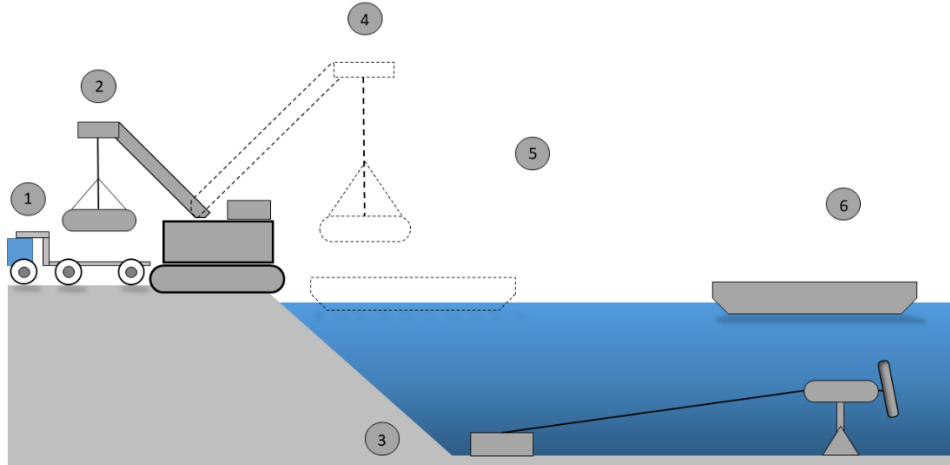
Deployment procedure for bottom mounted HKT. Step 1: Illustrates the generator assembly arriving on-site in a flatbed trailer. Step 2: shows the generator assembly being taken off a flatbed trailer using a crane. Step 3 involves accurately locating the anchoring point. Step 4 shows the turbine being loaded on the specially designed barge. Step 5 shows the transportation to the operational point. Step 6: Show the turbine being lowered and in operation at the bottom of the river.
